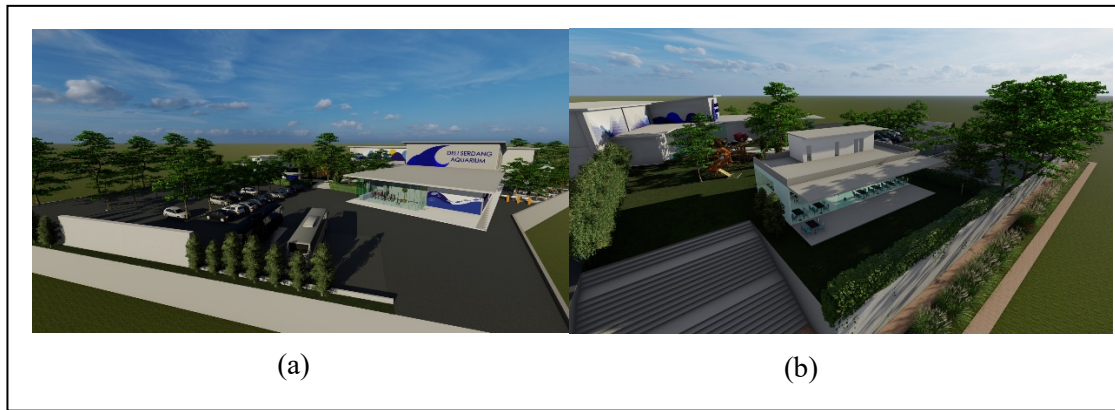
(a) Aerial View of The Front Facade, (b) Side View of The Building With Restaurant
